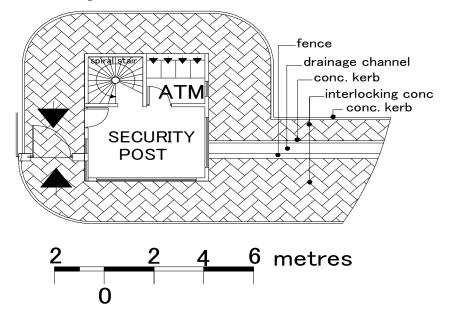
Ground Floor plan at security post showing the Surrounding setup. Source: author's design
